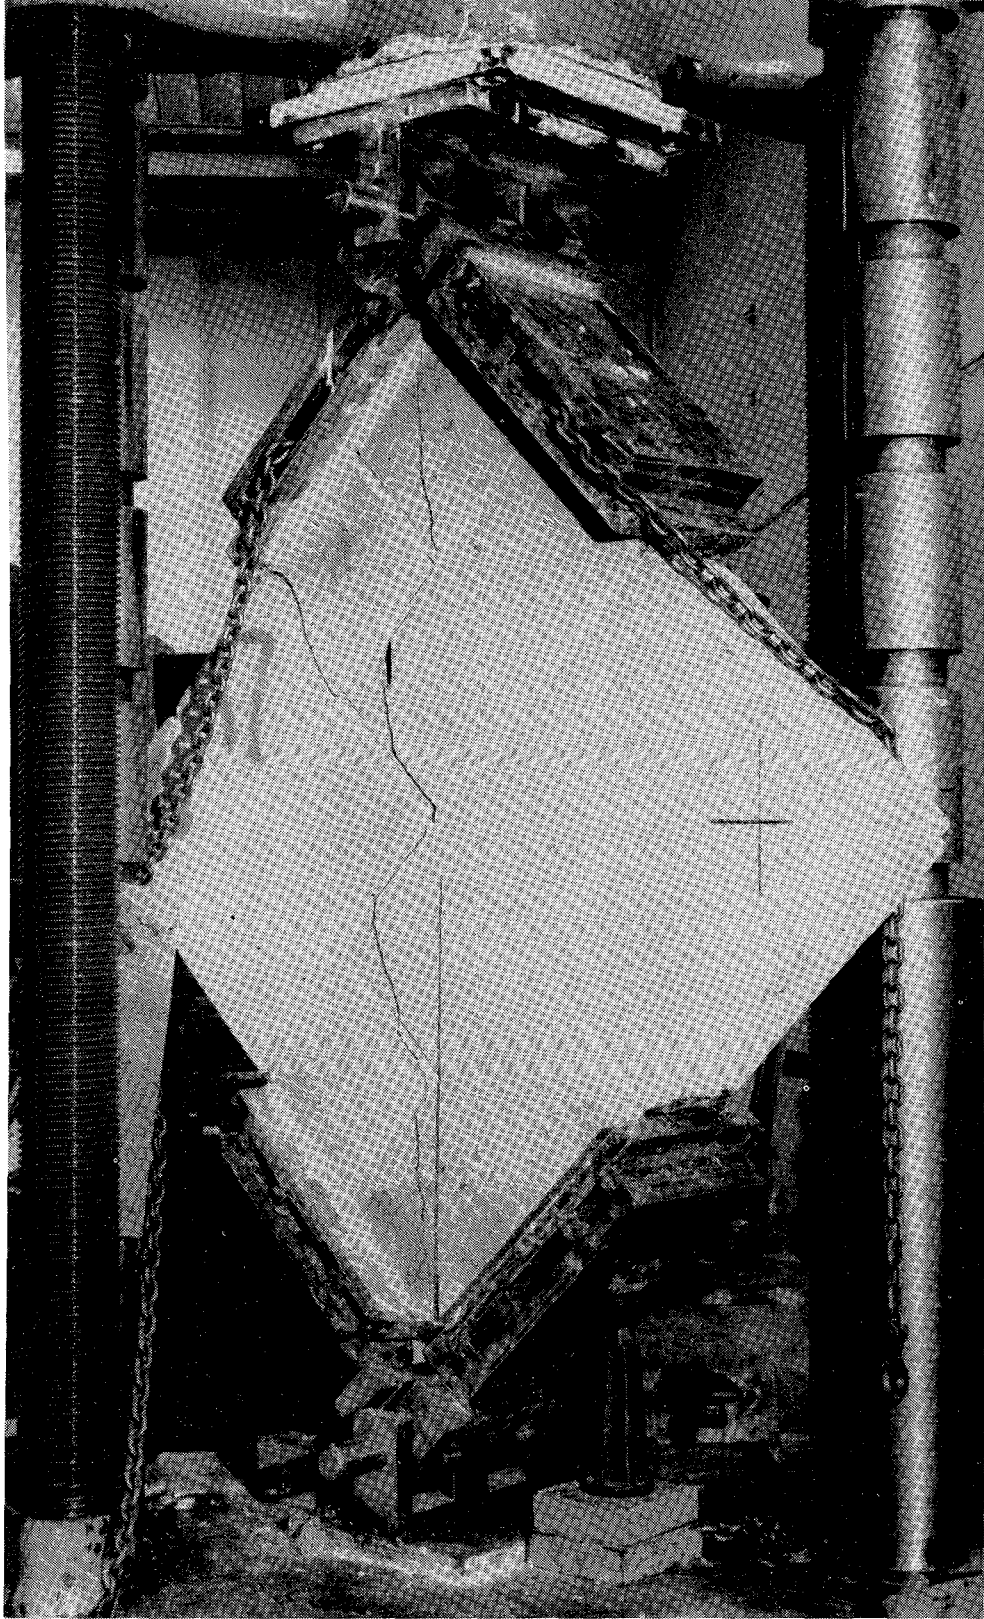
MODE OF FAILURE OF MODIFIED DIAGONAL COMPRESSION TEST
